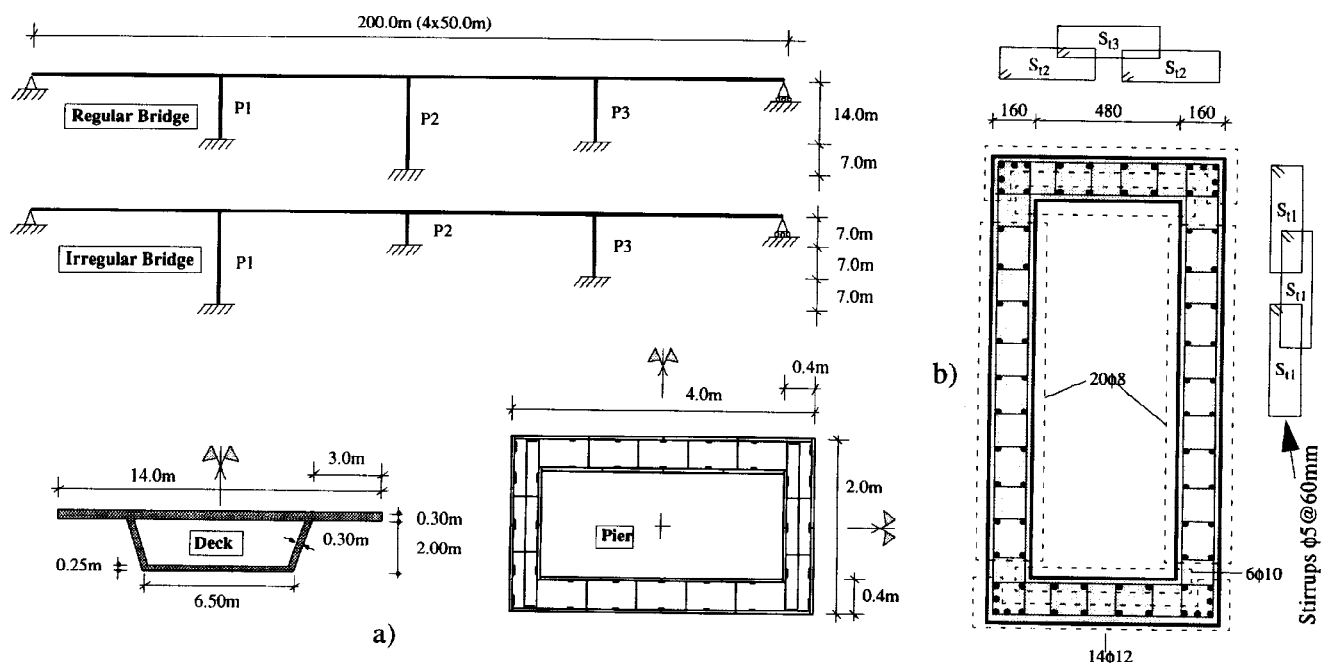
Bridges being tested pseudodynamically: a) Full-scale scheme b) Typical reinforcement lay-out of a scaled pier (central pier of B213A).
